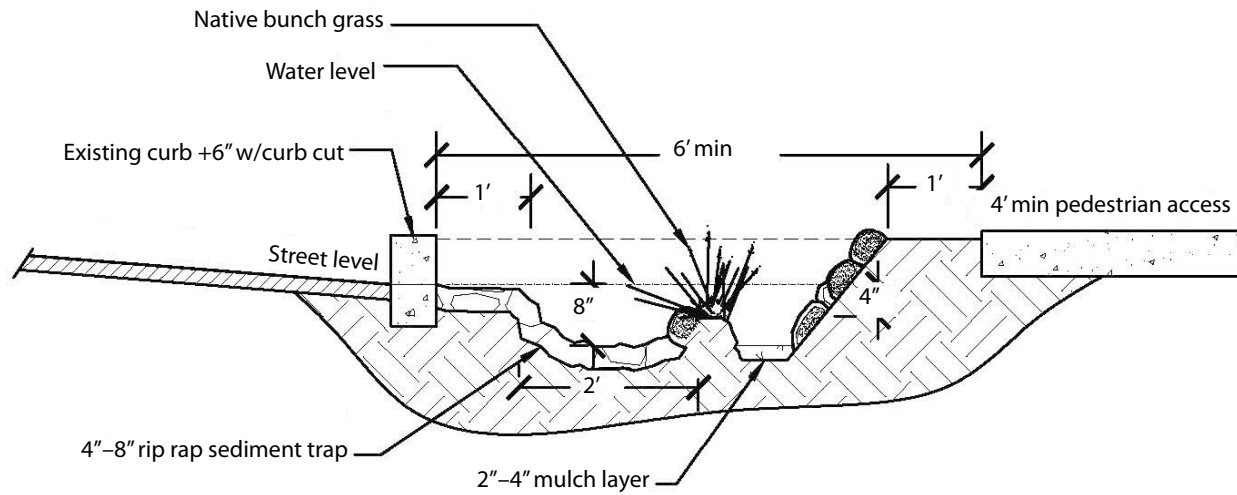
Section A1. Typical cross section of sediment trap for curb cut with rock-lined basin.
